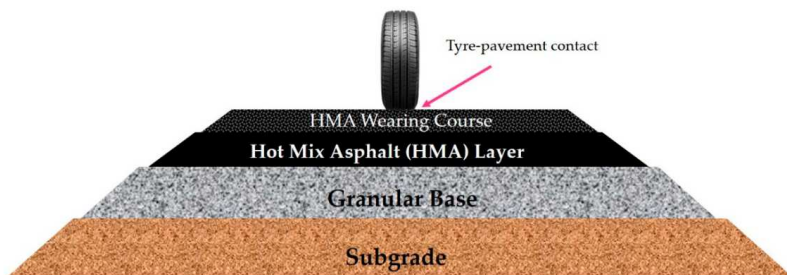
Schematic diagram of a typical road construction cross-section [17].
